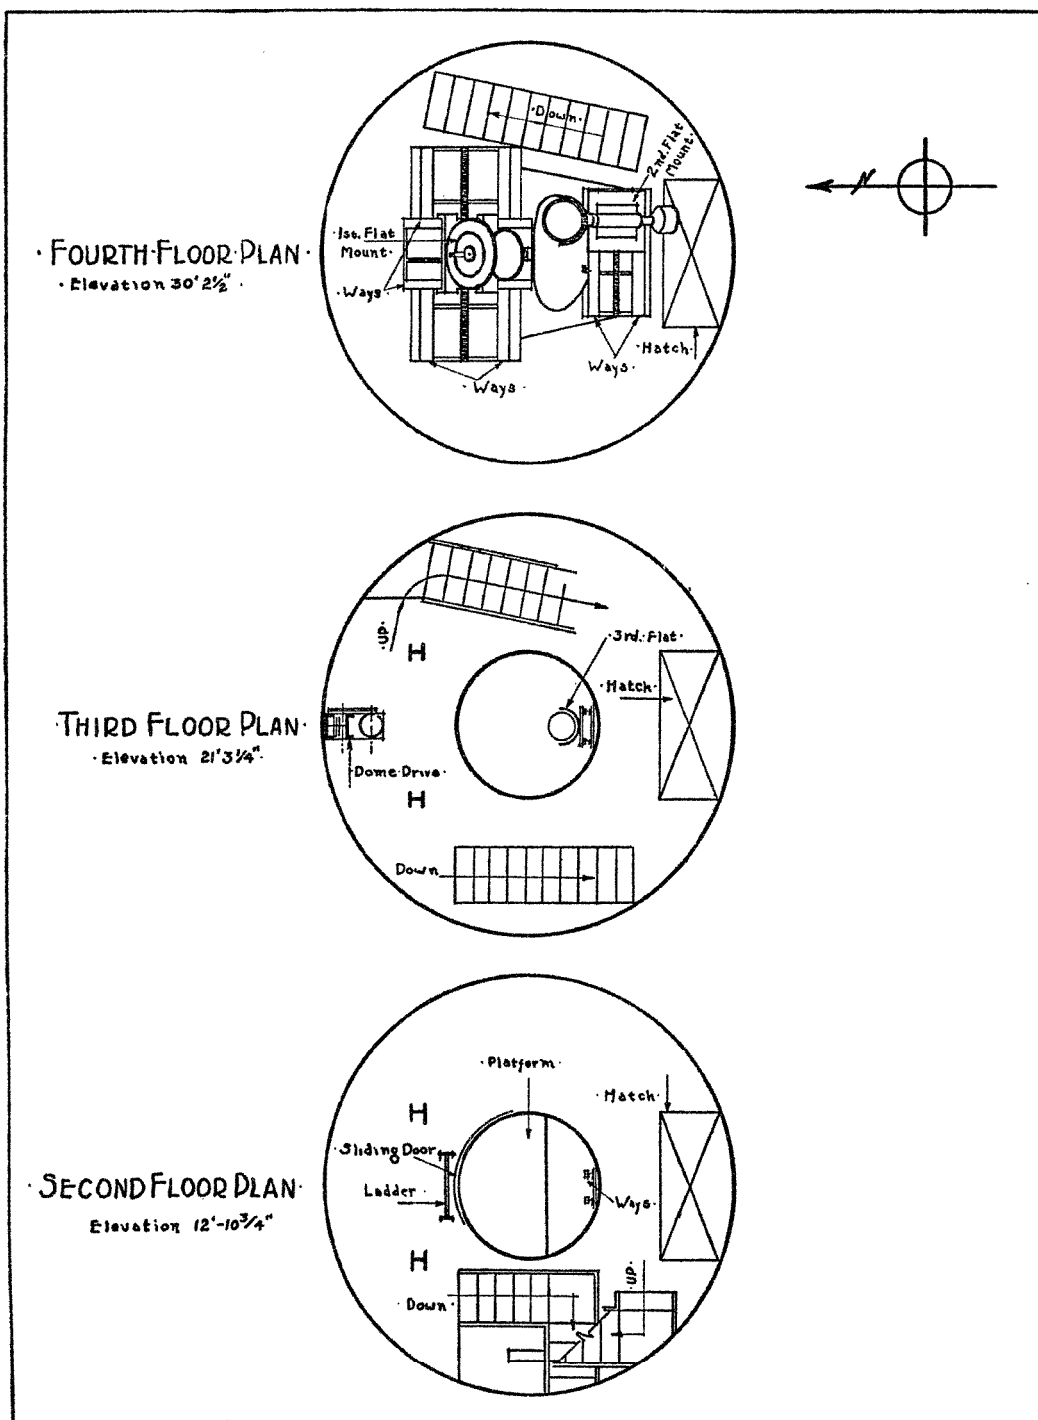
The Tower Telescope; Second, Third and Fourth Floor Plans.
